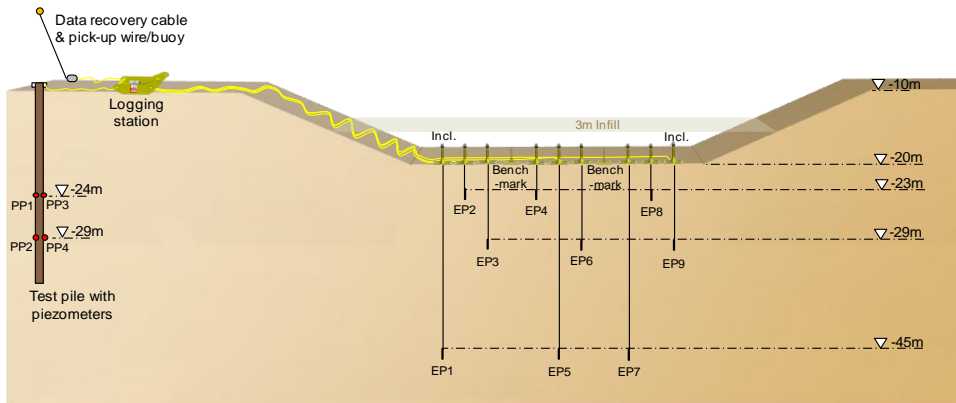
Overview of monitoring system with extenso-piezometers (EP1-EP9) and test pile piezometers (PP1-PP4)
